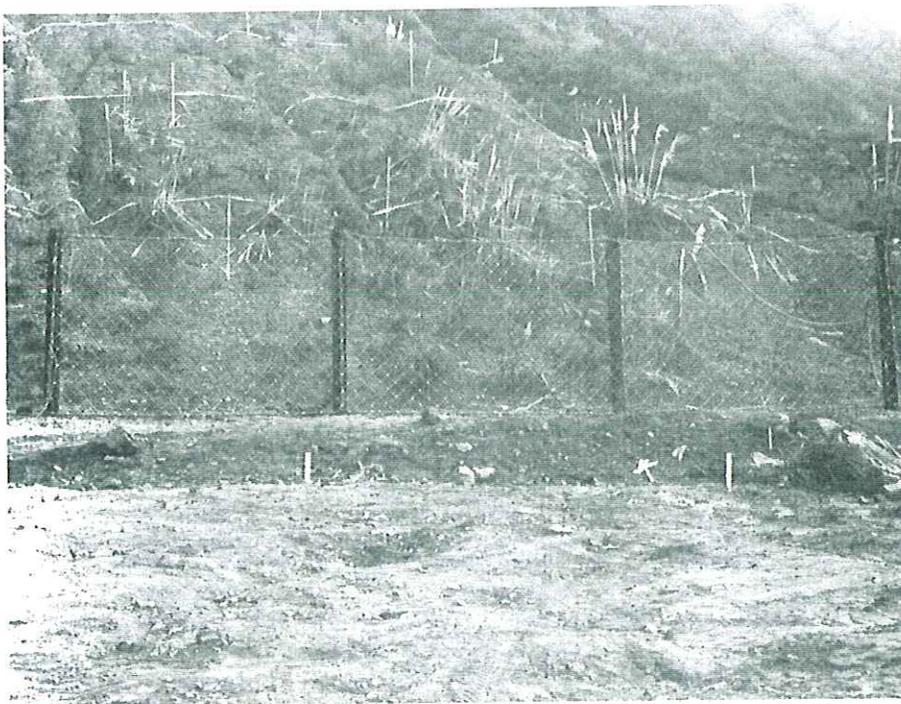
BRUGG ROCK NET AS IT APPEARS FROM ROADWAY GRADE
